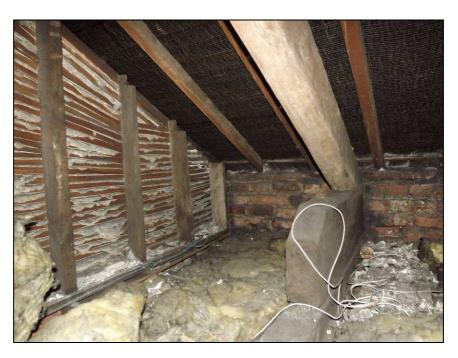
Detail of roof structure and lathe and plaster wall as seen in the eastern void of the roof
